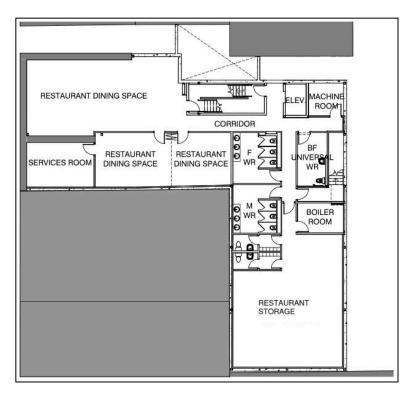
Exhibit B: Basement Floor Plan of the Proposed Redevelopment.
